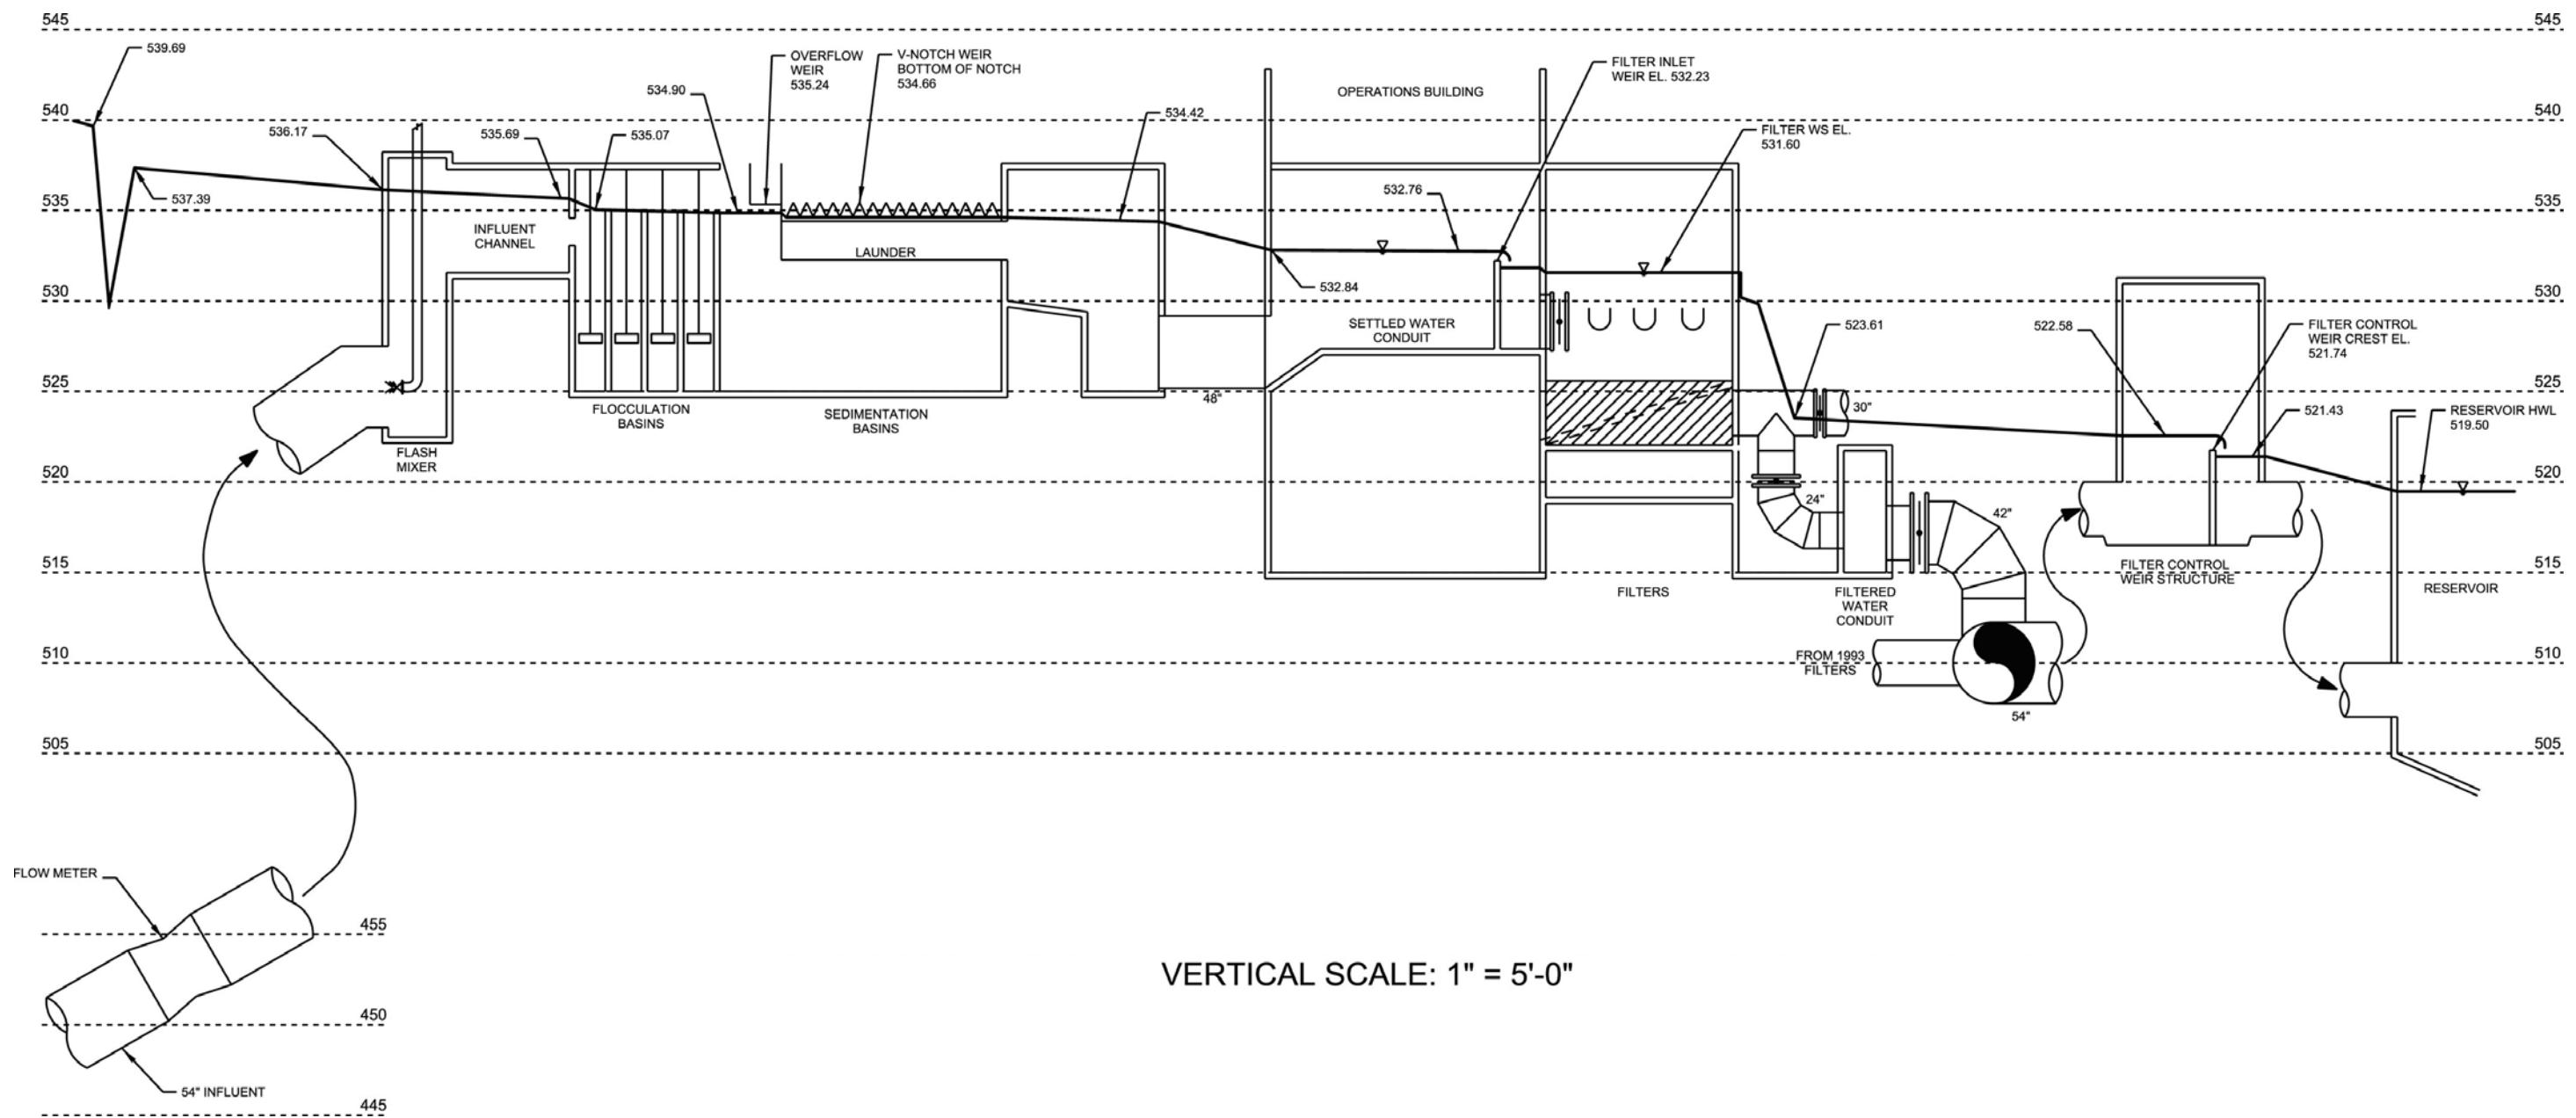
Plant Process Hydraulic Grade Line at 40 mgd
